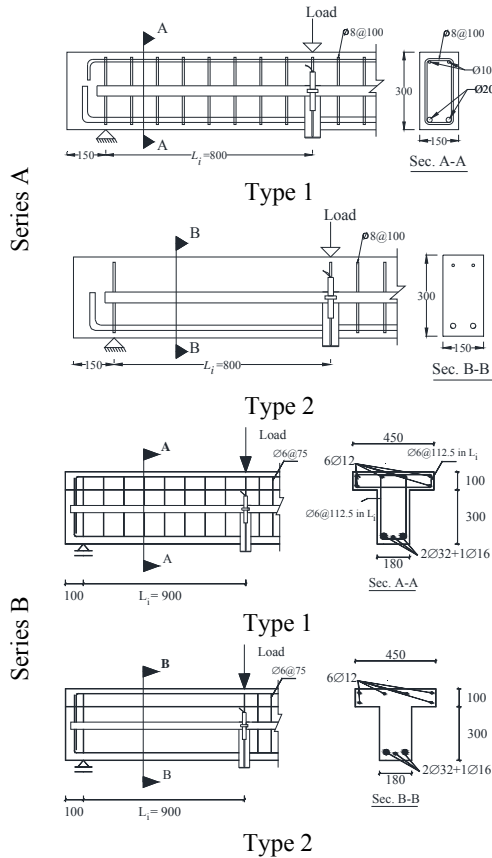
Support and loading configuration, geometry and reinforcements of the tested beams (dimensions in mm)
